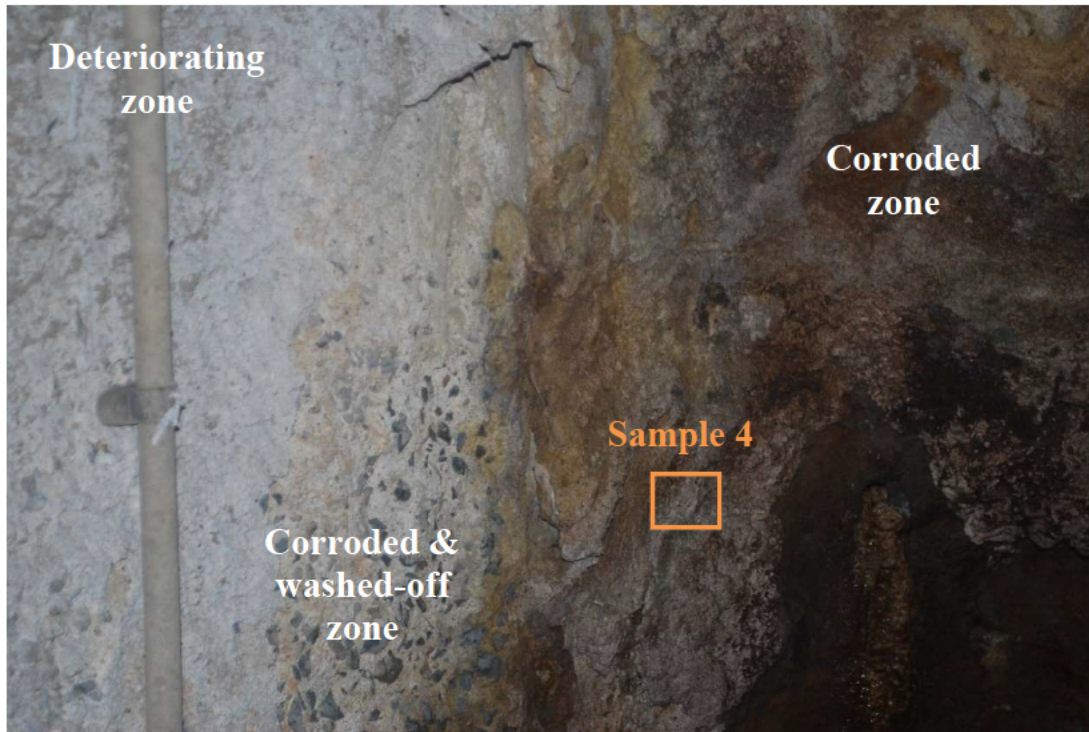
Sampling of corroded product on concrete wall
